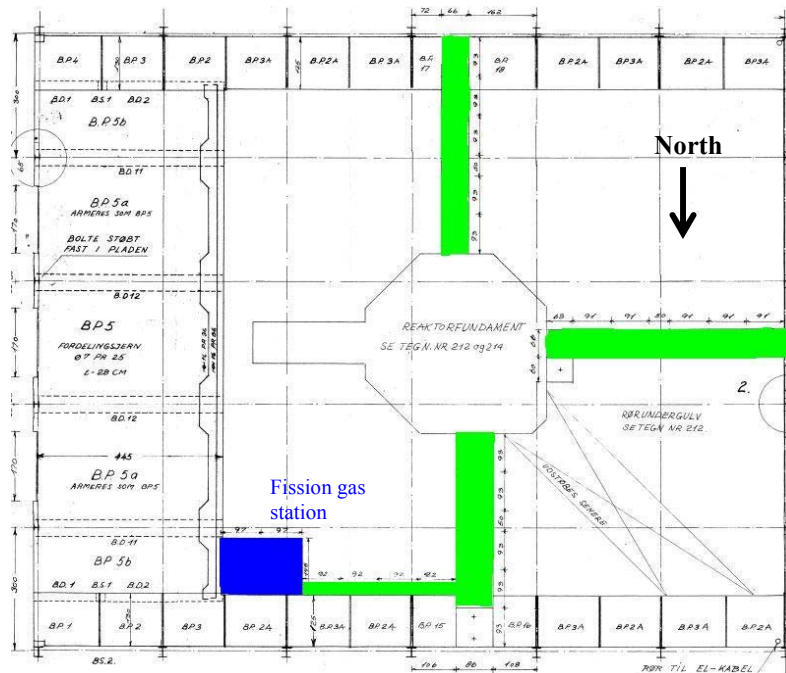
Sketch of the sub-floor structures in the reactor hall, showing the three channels (green) and the fission gas station (blue).
